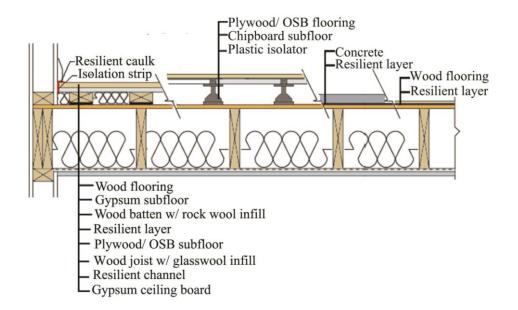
Various details of the floating floors designed for the timber frame floor (Reassembled by author).
